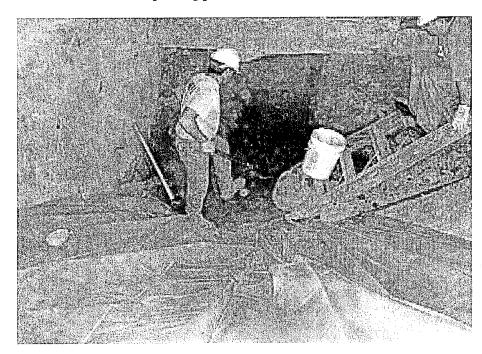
Photograph below shows the final depth on the excavation along the interior western wall of the Chromium Room. In the center of the photograph a wooden bridge can be scene. This bridge was constructed to move equipment and personal in/out of the Chromium Room and over the excavation, which extends the entire length of the western wall. Also scene in the photograph is the hose to the confined space blower, which stream a continuous flow of fresh air into the Chromium Room. In addition the ladder was placed in the excavation for emergence exits, as required OSHA.
